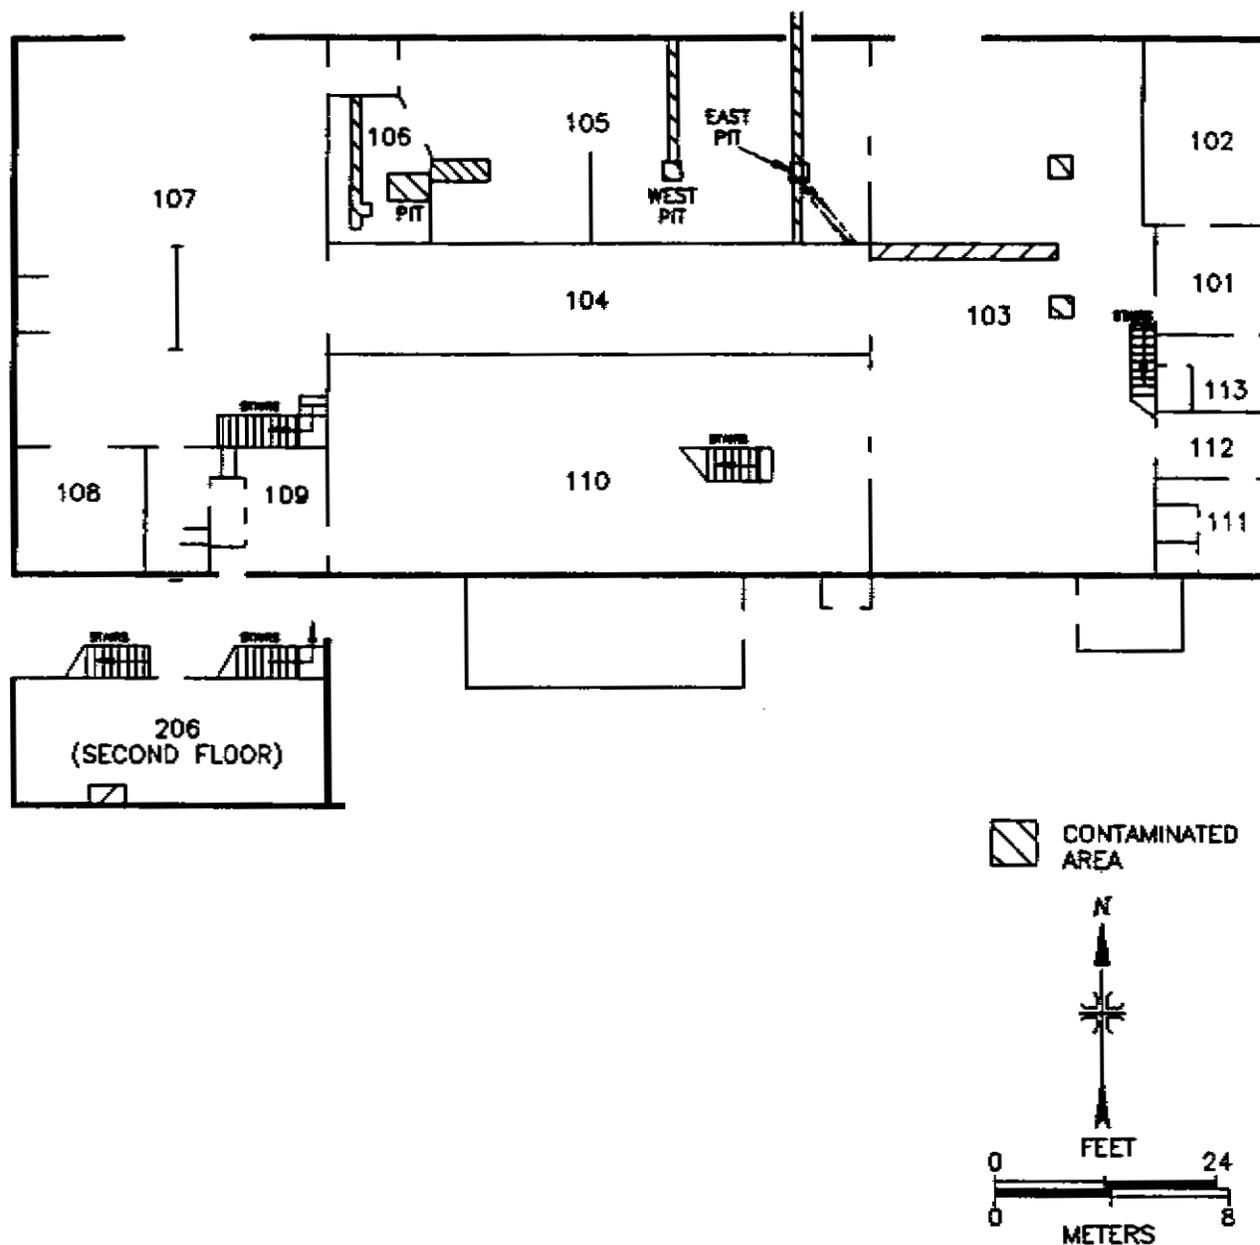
Building 4 Plot Plan, First and Second Floors
